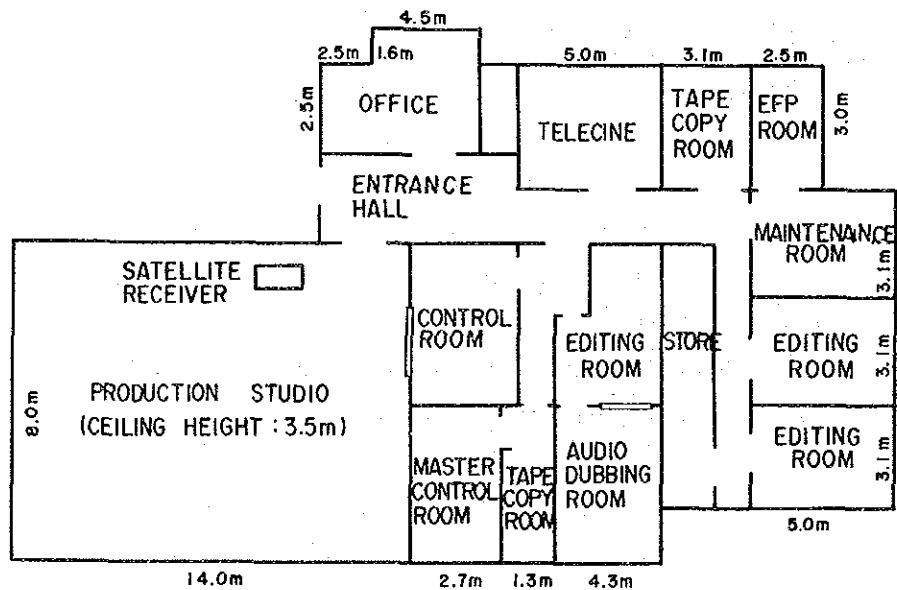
Plan of the Existing Studio Building of the Lao National Television
